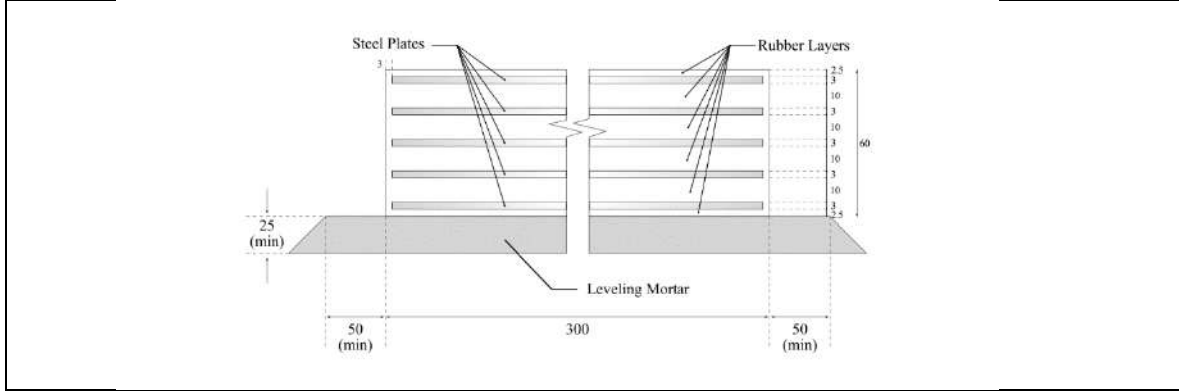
Detail of elastomeric bearings (dimensions in millimeters).
